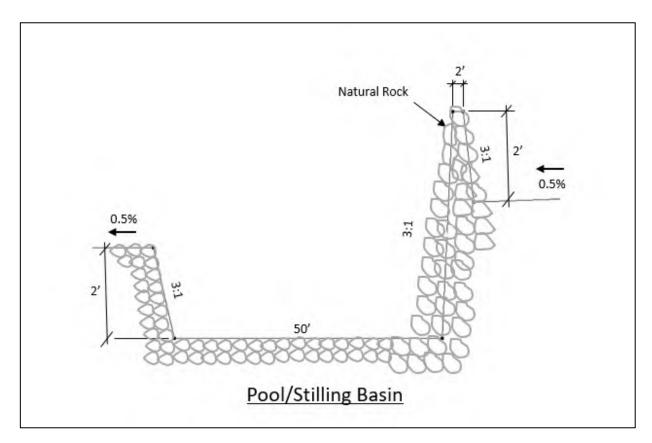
| Typical Rock Stabilization Structure Profile View, Looking West
